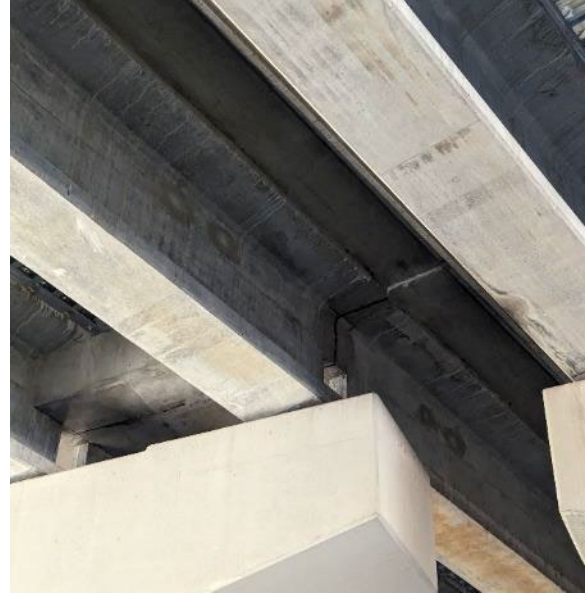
(o): Closed joint on the underside of bridge at Bent 3
